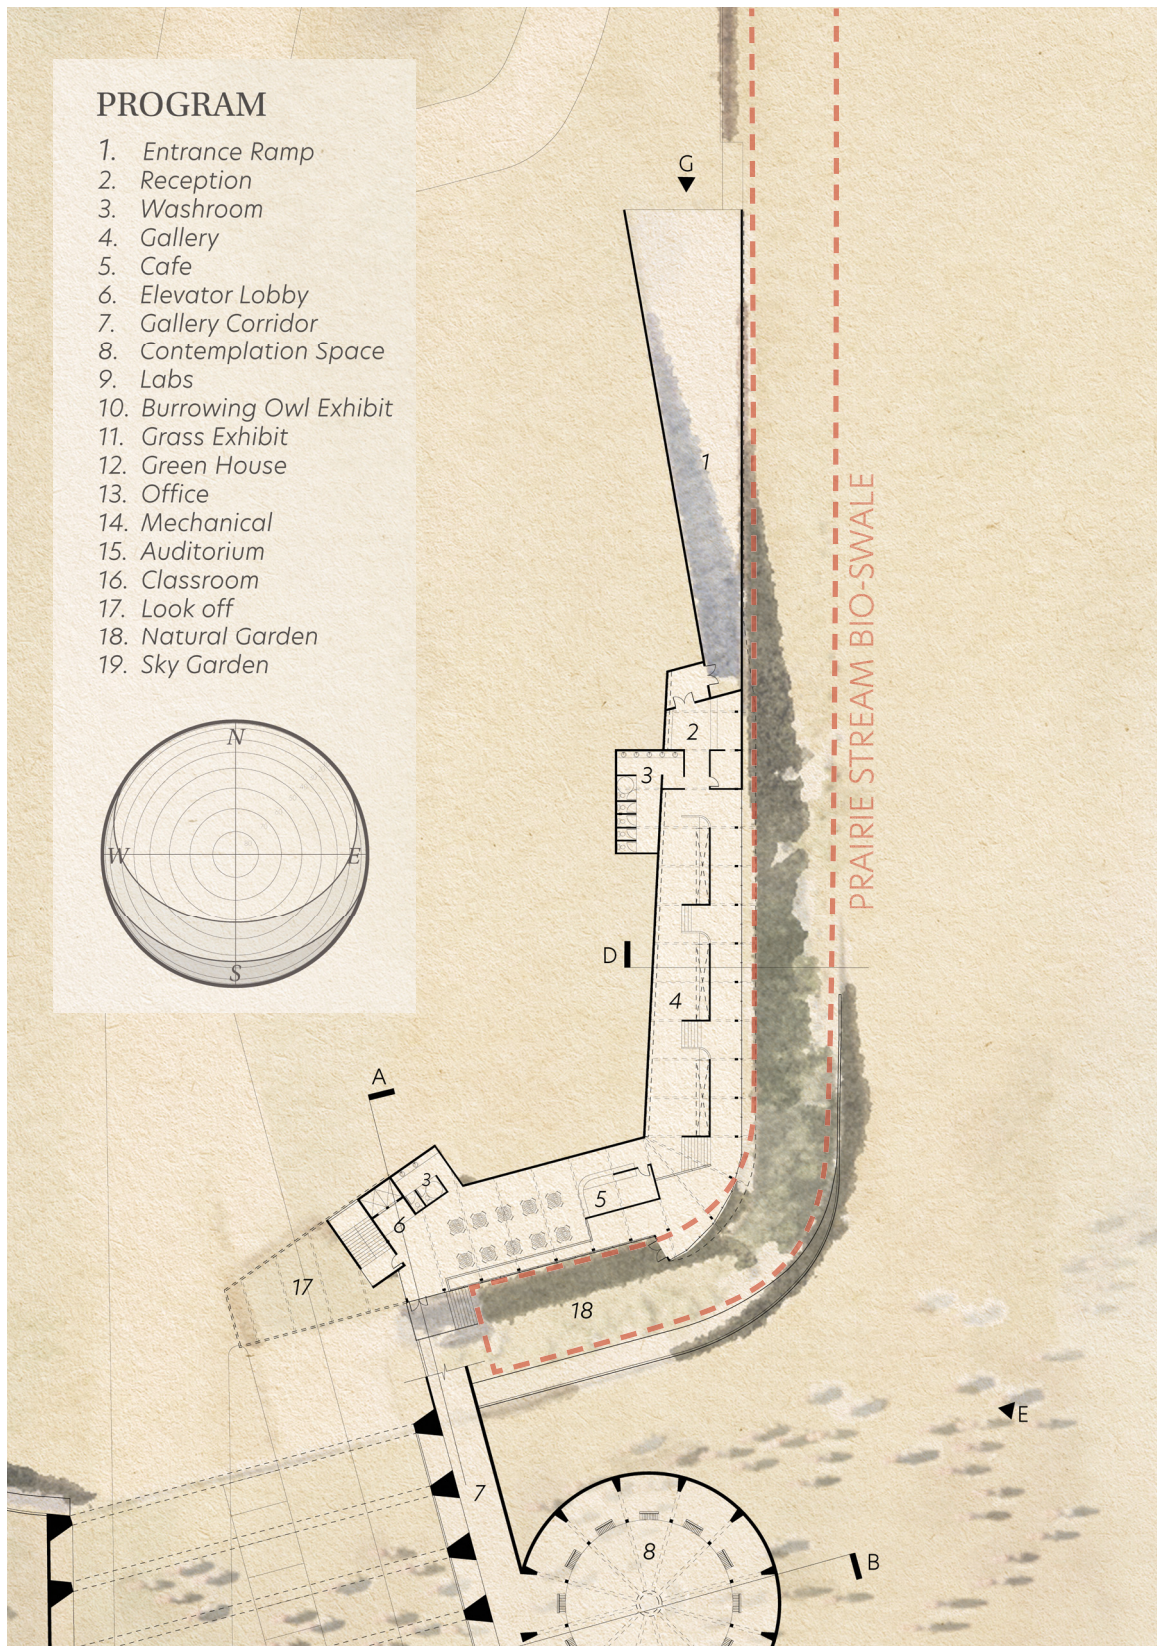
Zoomed-in portion of the floor plan showing the entrance ramp (1) and gallery corridor (4). Outside of the gallery, the bio-swale habitat ends in a natural garden area (18).
